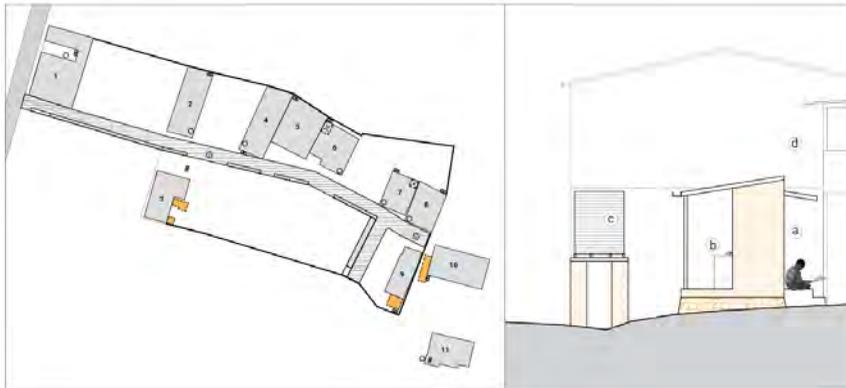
[Left] Wetpod strategy illustrated in plan shows new wetpods in orange, provided to buildings 3, 9 and 10. [Right] Section showing a wetpod with detached rainwater tank adjacent to an existing building.
